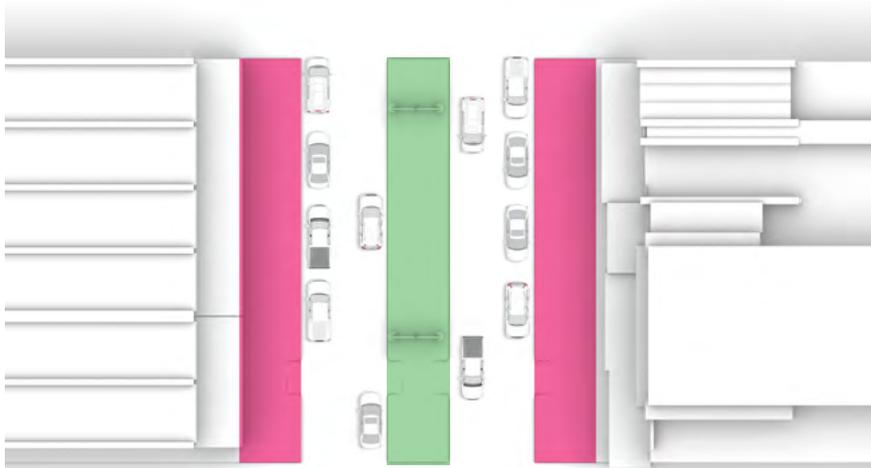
Scenario B Plan - A widened median and widened footpath along Firebrace Street
